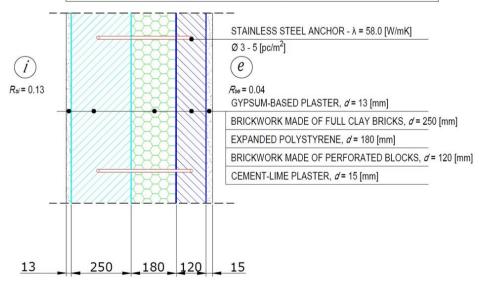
Sandwich composite comprising: load-bearing exterior wall (the building's envelope). Structure of envelope no. 1 (*author's archive*)
